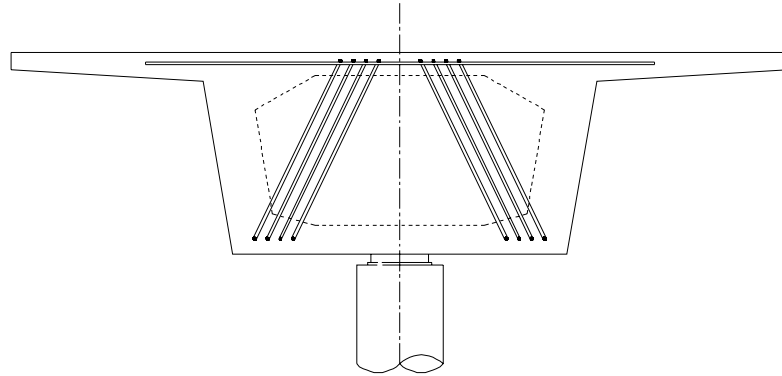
Diaphragms with indirect support. Links as suspension reinforcement
